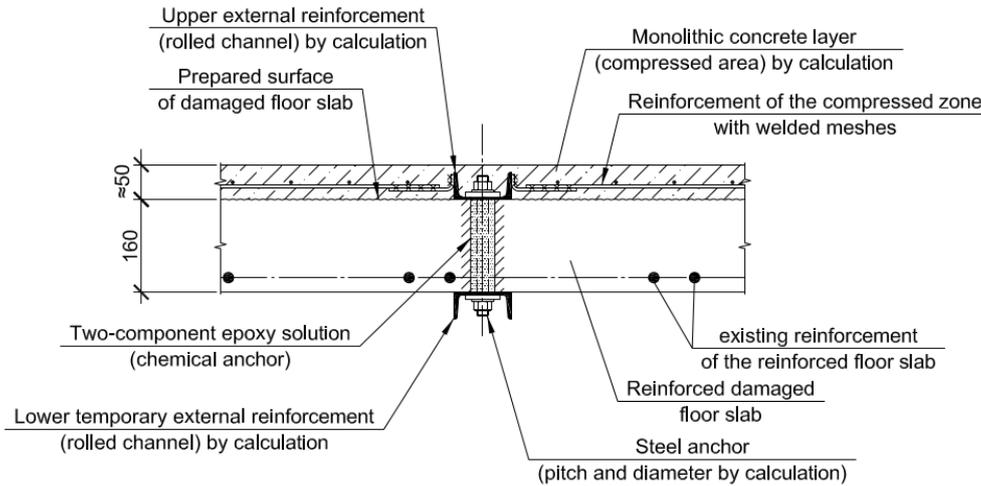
Scheme of floor slab strengthening by enlarging the compression zone (steel beams underneath, anchors, and concrete overlay on top)
